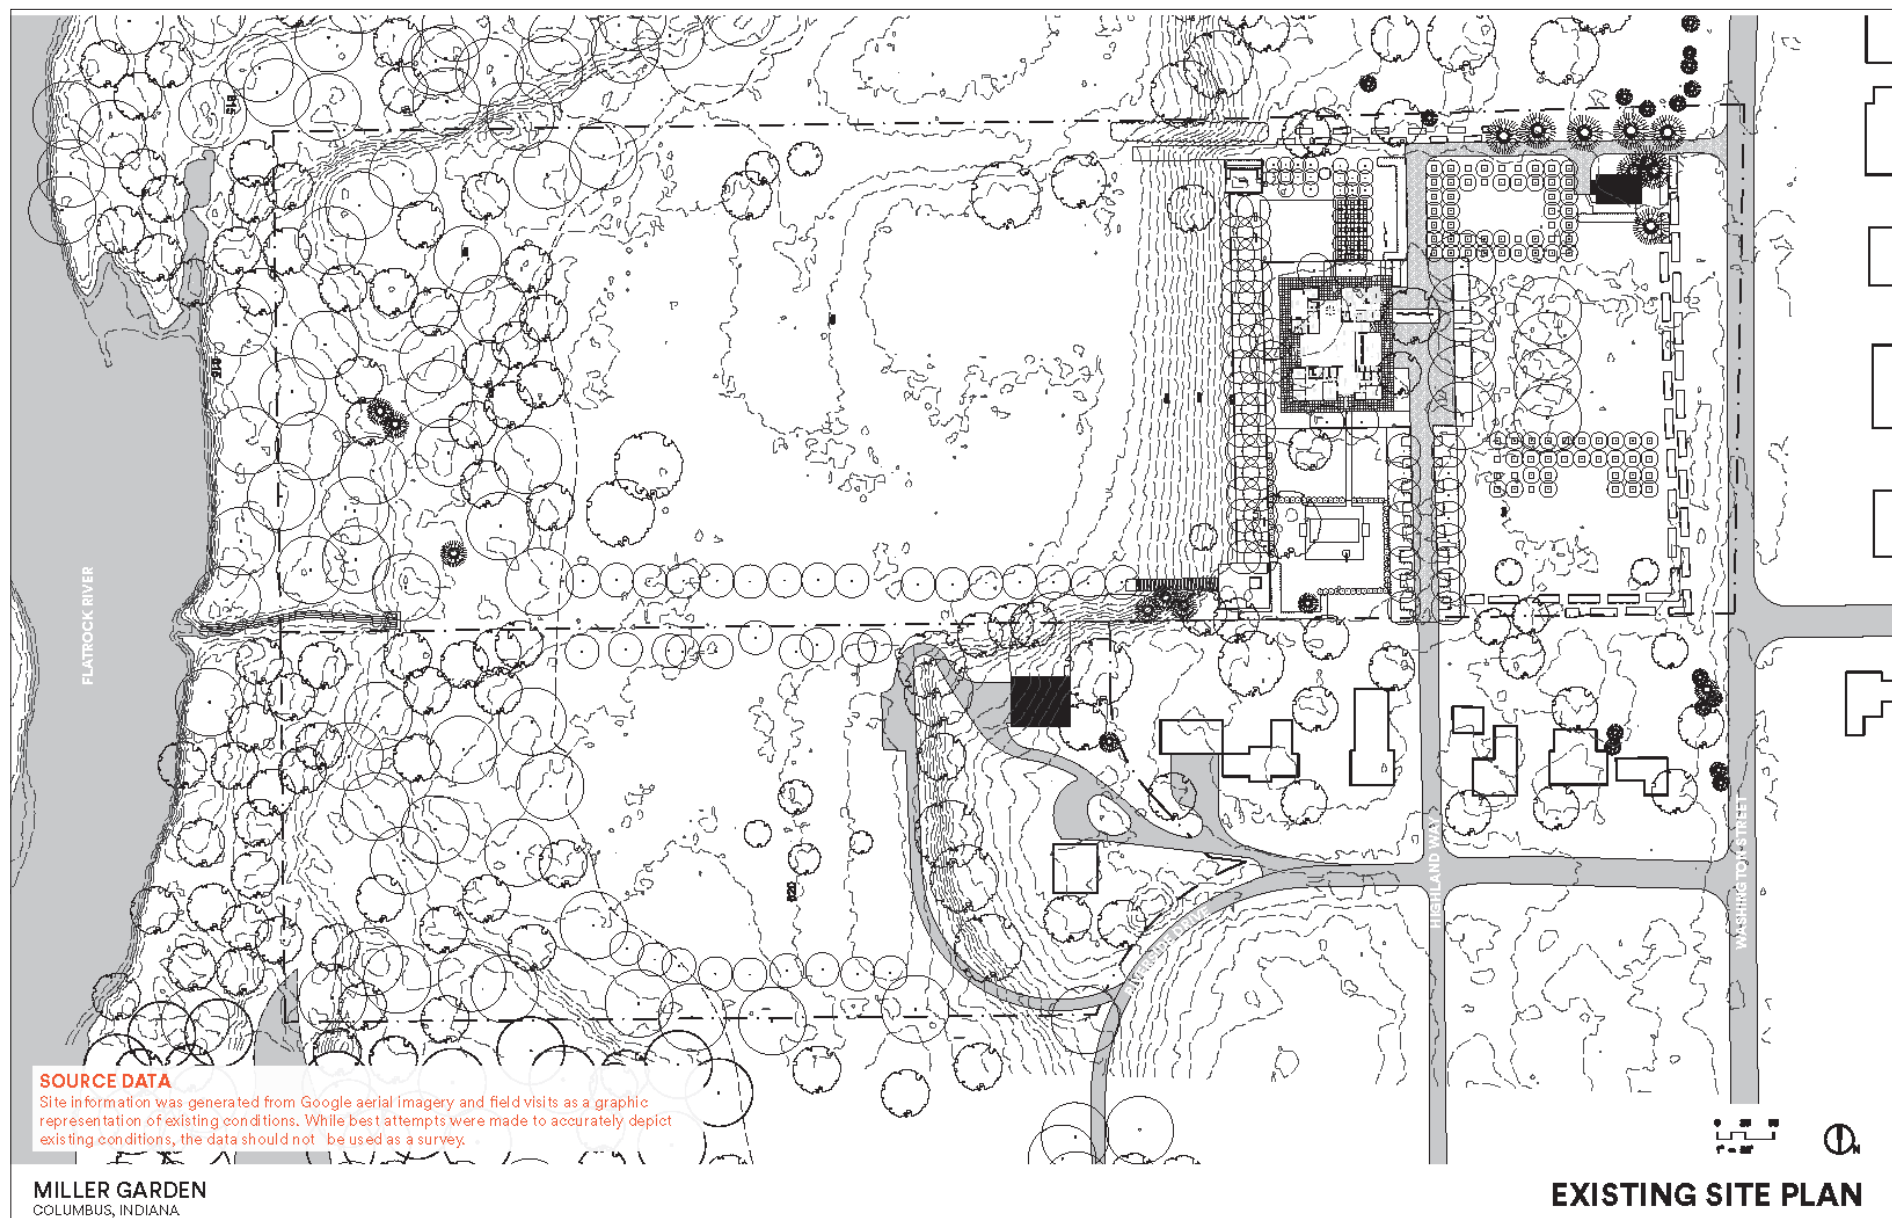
Existing conditions plan. Date: 2021. Photo credit: PennPraxis/DAVID RUBIN LandCollective.
